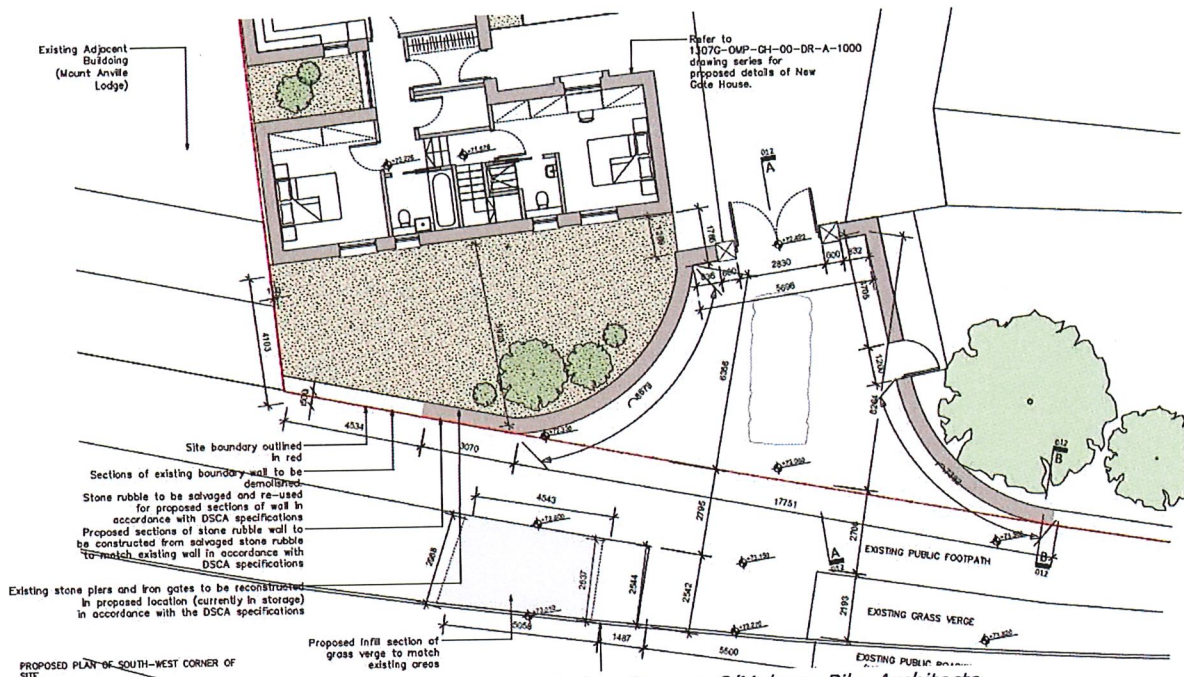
Entrance to Cedar Mount House proposed plan. Source: O'Mahony Pike Architects.
